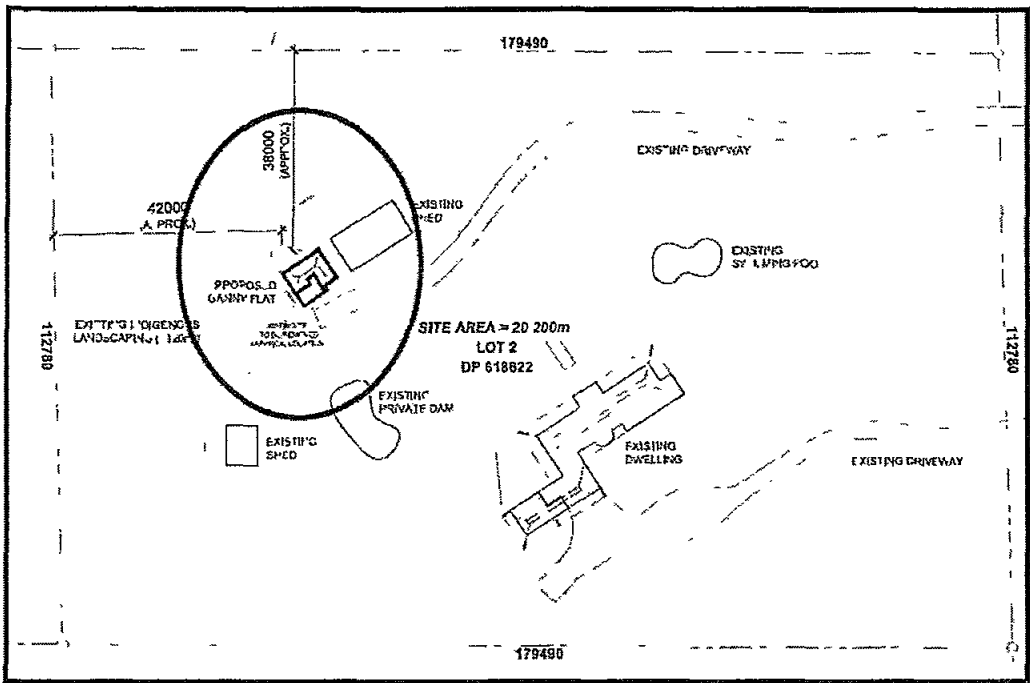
Site Plan of Proposed Work 17 Minkara Road Bayview
